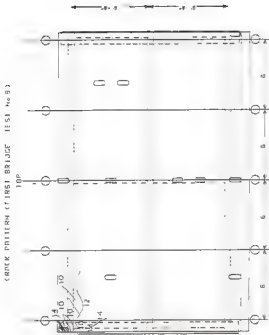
Top Cracking Pattern (First Bridge - Test No 9)
